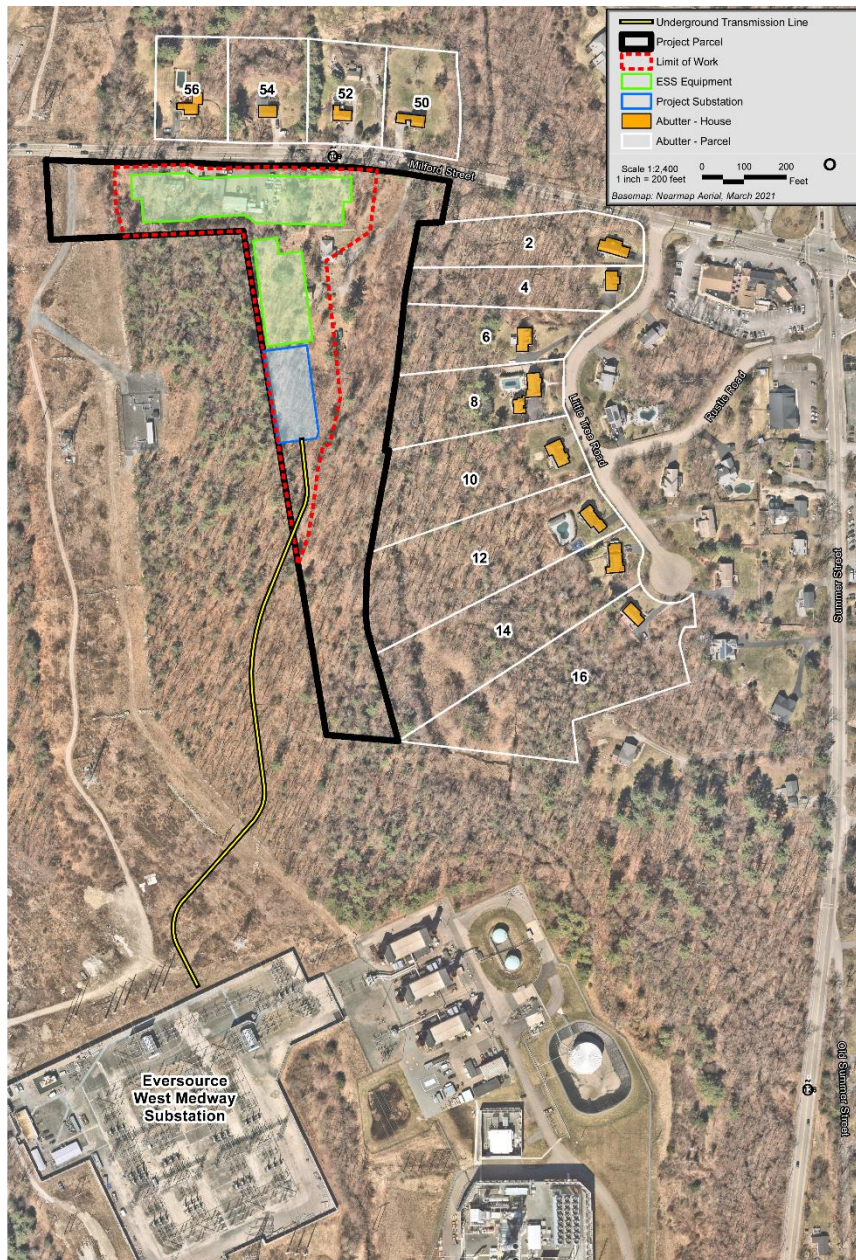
Proposed Site Plan for the 250-MW BESS in Medway, Massachusetts.
